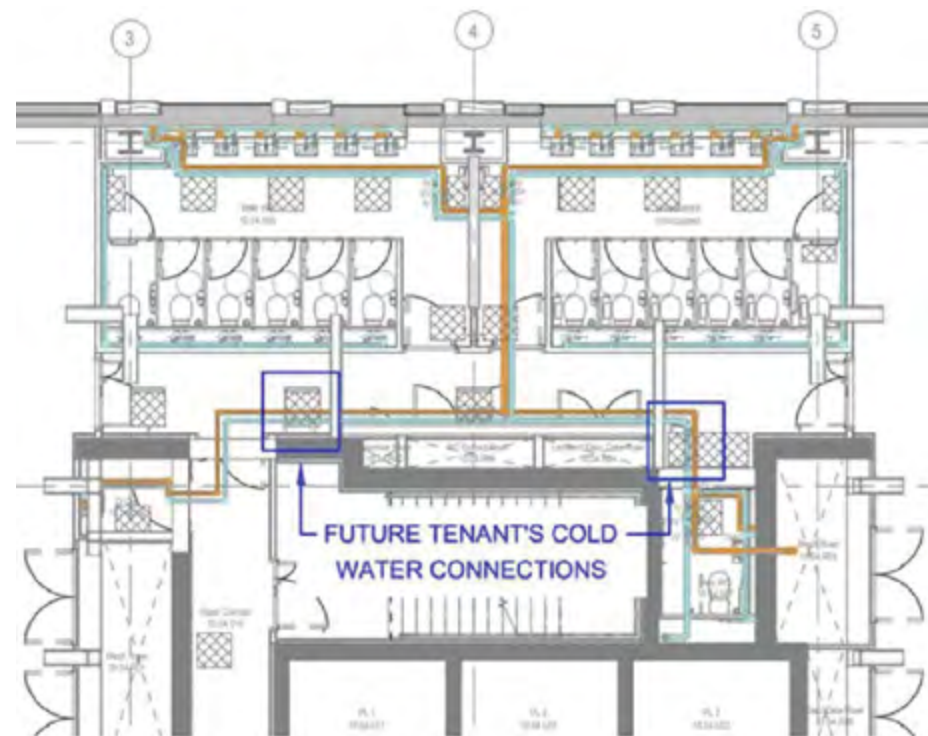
LOCATION OF DEMOUNTABLE SECTIONS IN COLD WATER PIPEWORK FOR TENANT SERVICES CONNECTIONS
